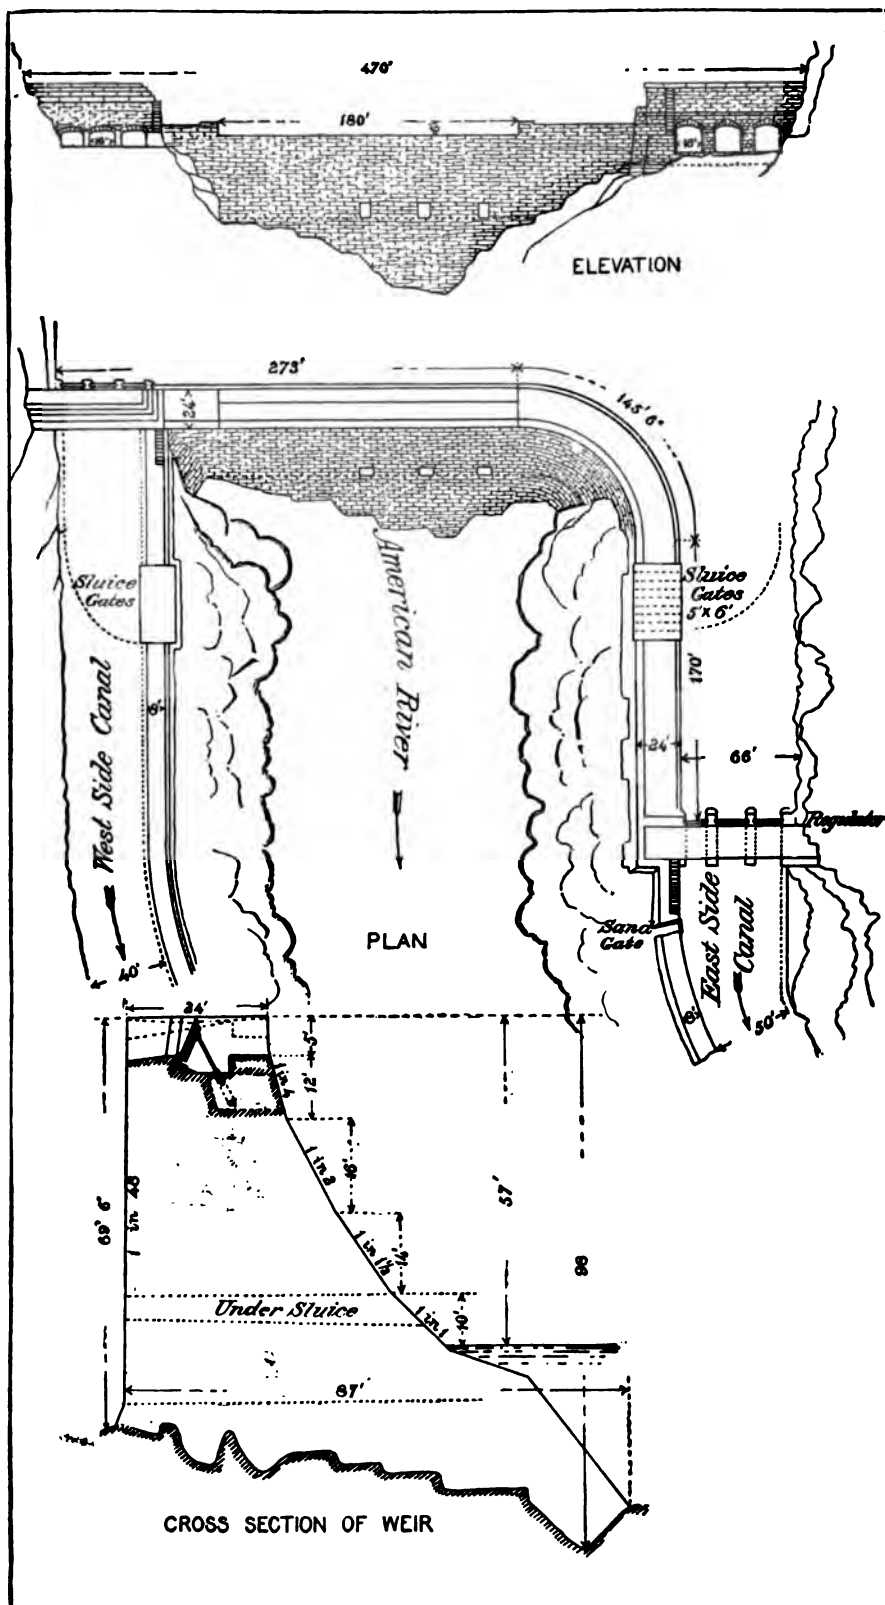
PLAN, CROSS-SECTION, AND ELEVATION OF WEIR AND HEADWORKS OF FOLSOM CANAL.
